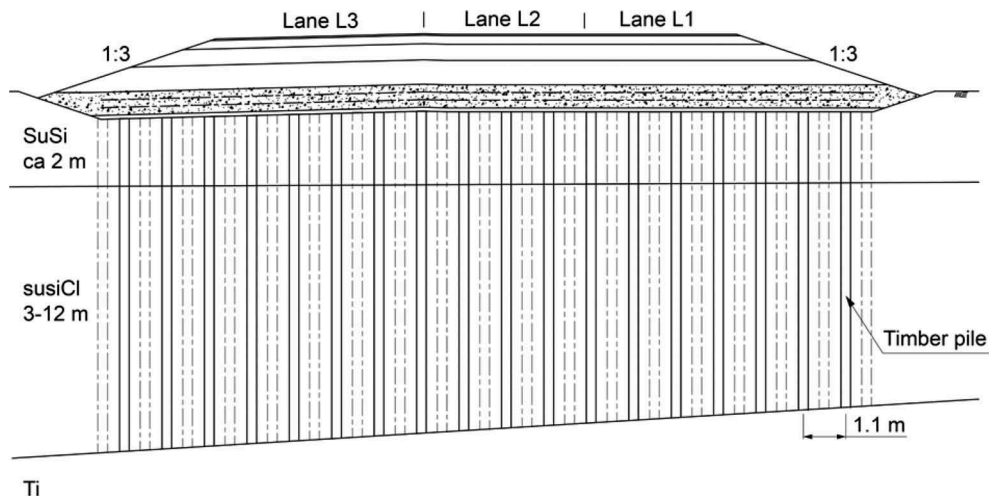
Cross section of the monitored geosynthetic-reinforced timber pile-supported road embankment and soil profile.
